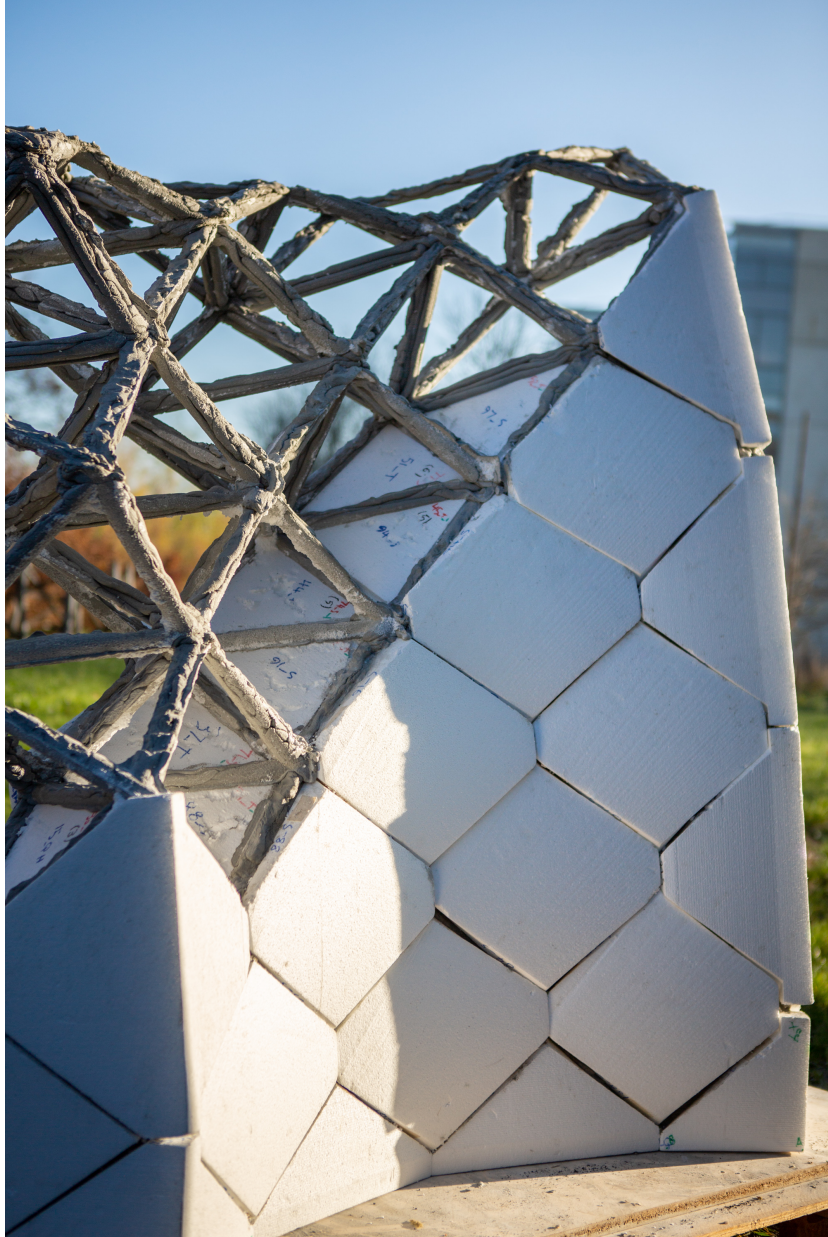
Space Truss Masonry Wall with Robotic Extrusion [27, 28]
